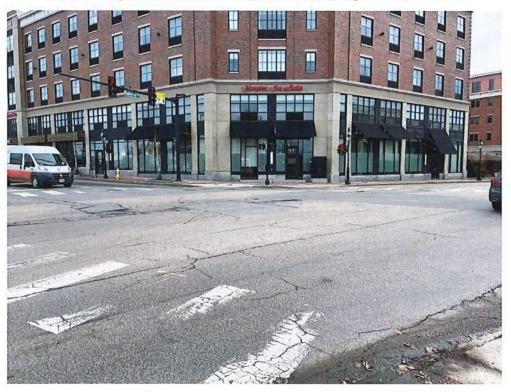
Maplewood Ave and Deer Street intersection looking east. Taken 1/19/23
